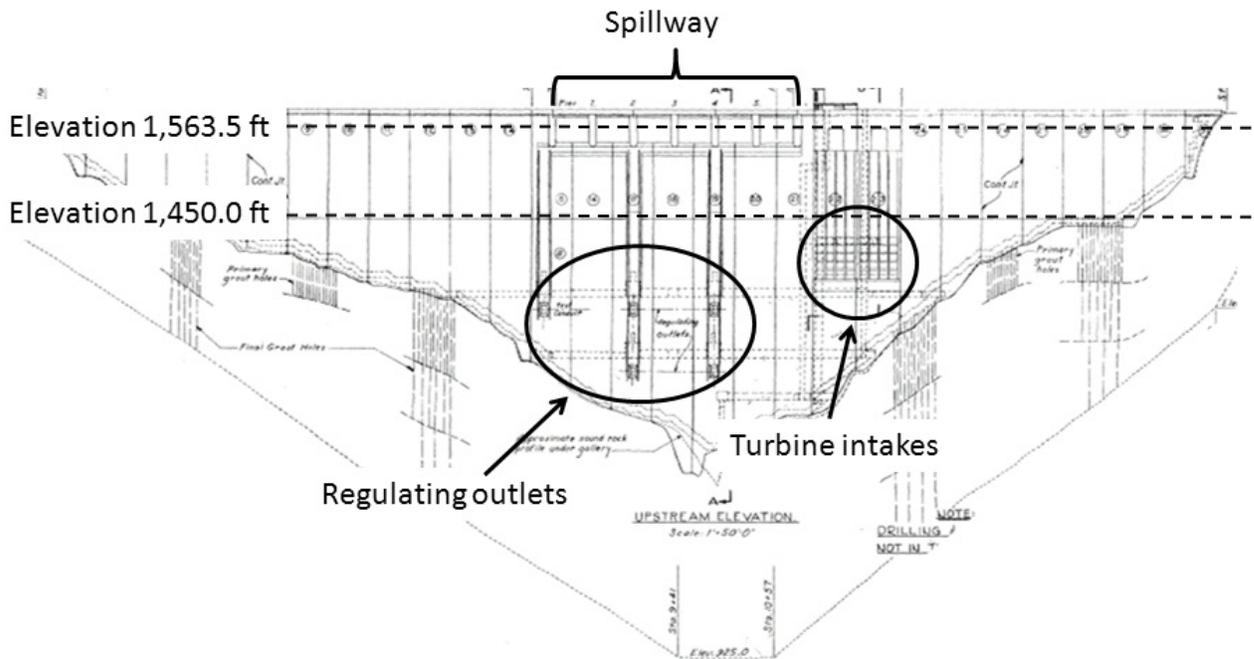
Elevation view of the upstream side of Detroit Dam showing outlet structures and elevations of full and minimum conservation pool. Modified from U.S. Army Corps of Engineers.
